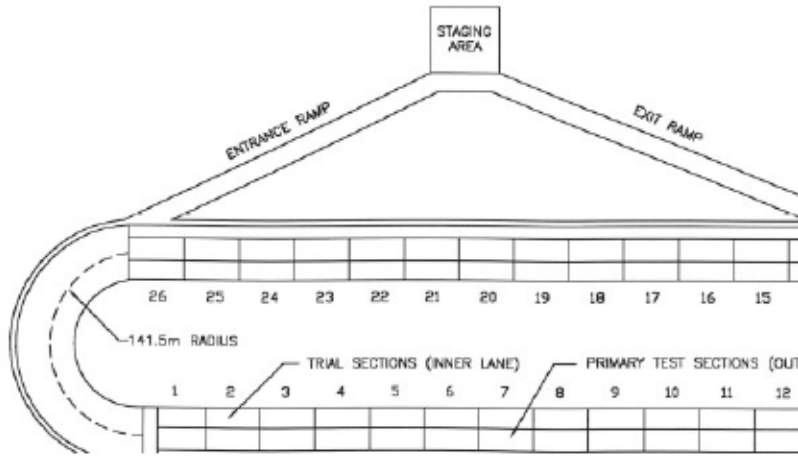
Layout of WESTRACK, WesTrack Team (not to scale), 1998.
